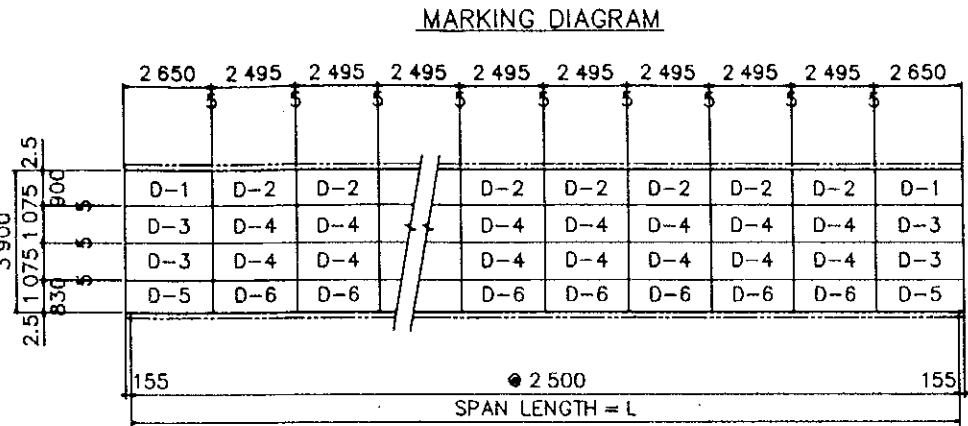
PREFABRICATED STEEL BRIDGE (2/3)
